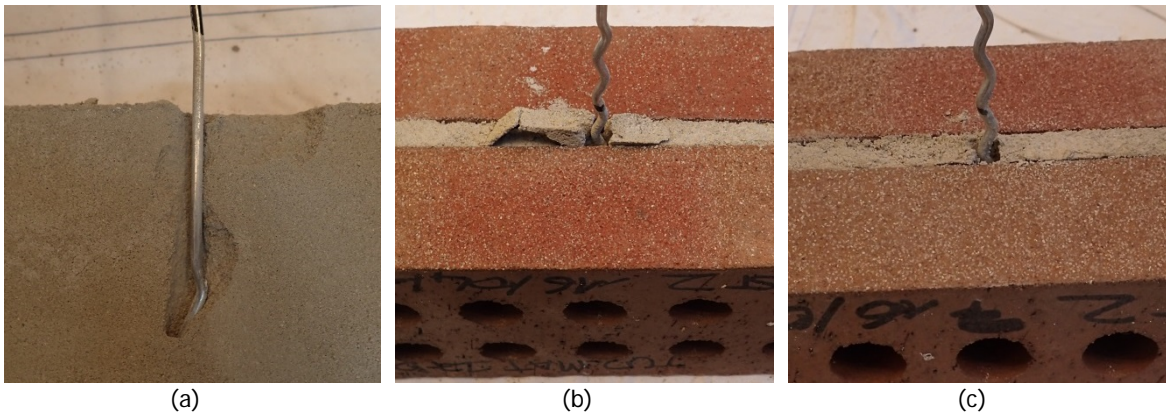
Crack patterns for masonry wall ties: (a) straightening of the hook combined with mortar crushing; (b) cone failure; (c) bond failure.
